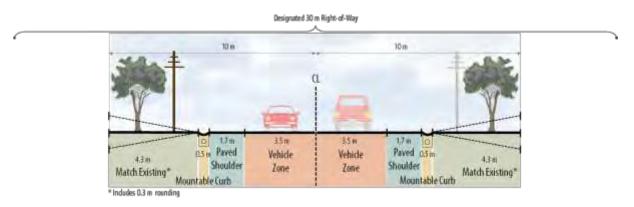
11.4 m Platform Semi-Rural Cross-Section for Winston Churchill Boulevard
